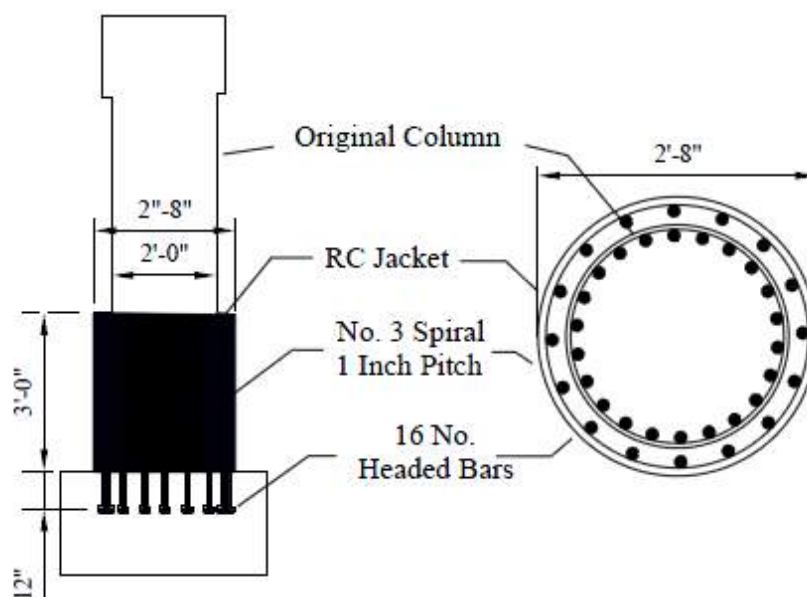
geometry and reinforcement of columns 430SR with spiral reinforcement [23].
